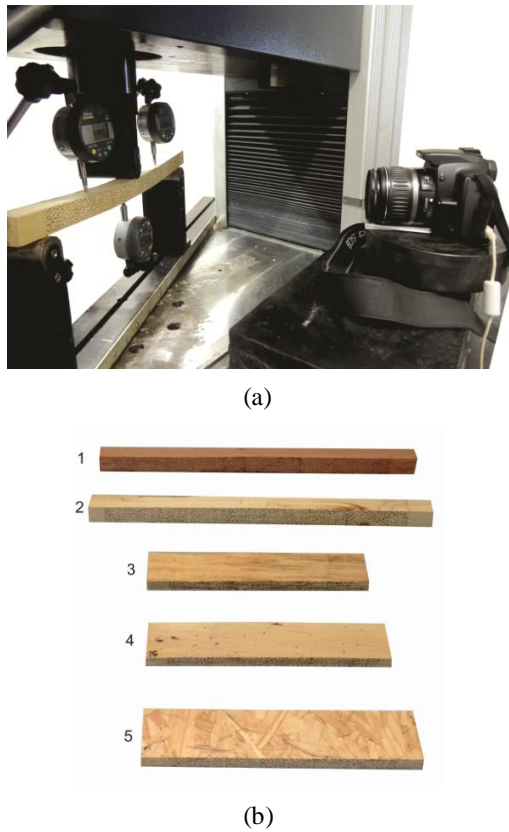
General View of the Universal Testing Machine and the instrumentation of the static bending test for the application of the PIV technique (a) and the samples used on the experiment (b).
